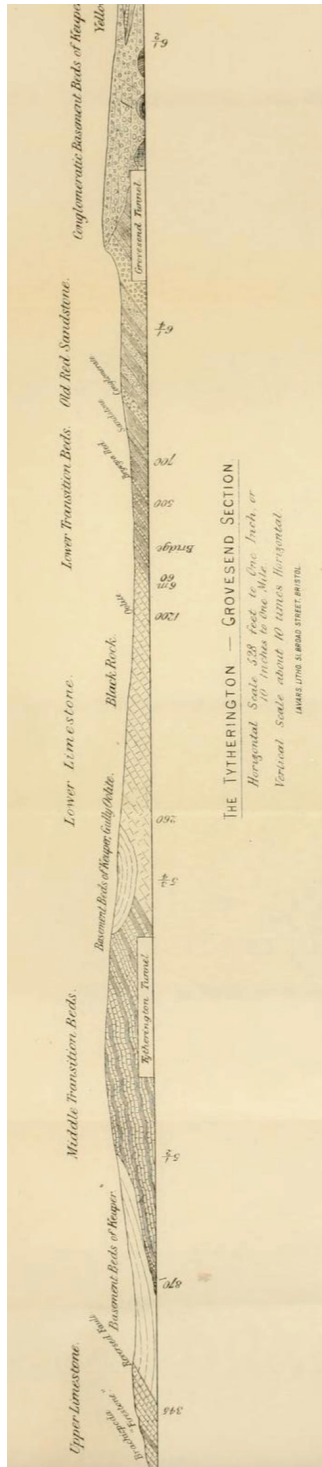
Section through Tyttherington Tunnel Section. From Lloyd Morgan, 1889.
